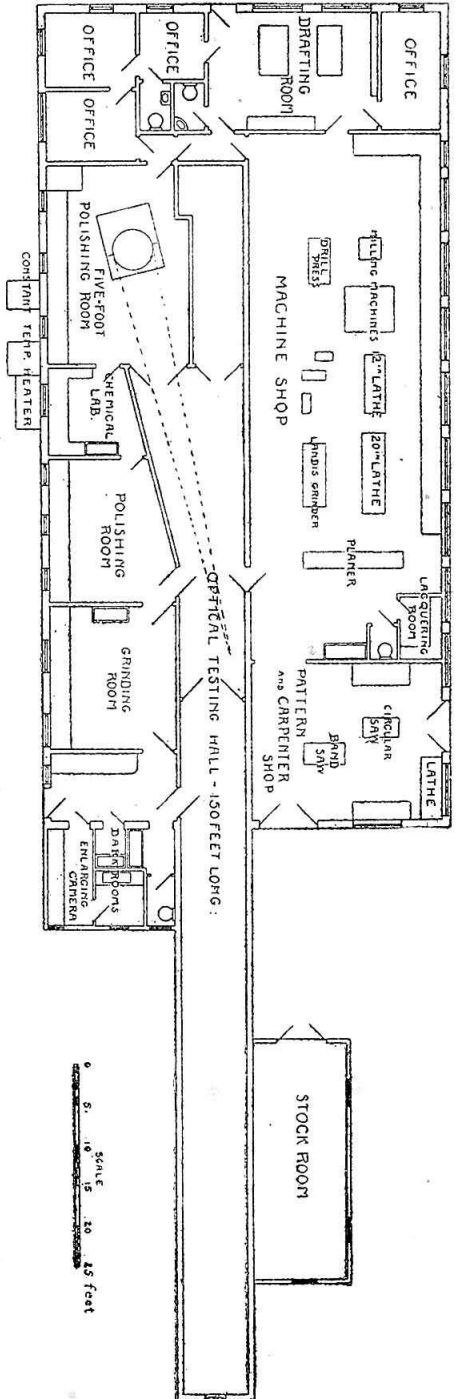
Plan of Pasadena Office and Instrument Shop.
